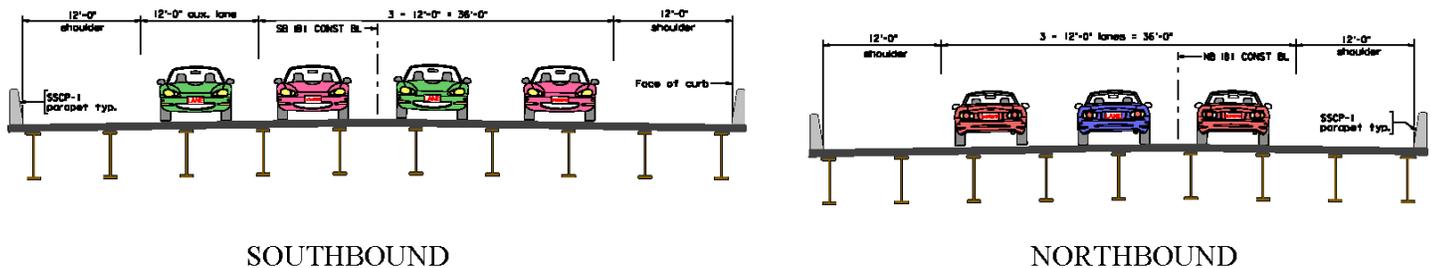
Transverse Section - I-81 Over Route 112 (Wildwood Road)
